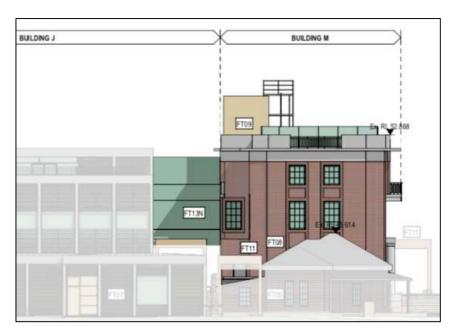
New bridge connection proposed between MET Building and new Building J and roof-top lift pavilion-Elevation view west (Source: FJMT 'Façade Diagrams, DA-5907, SSDA-01, 18.12.19)
